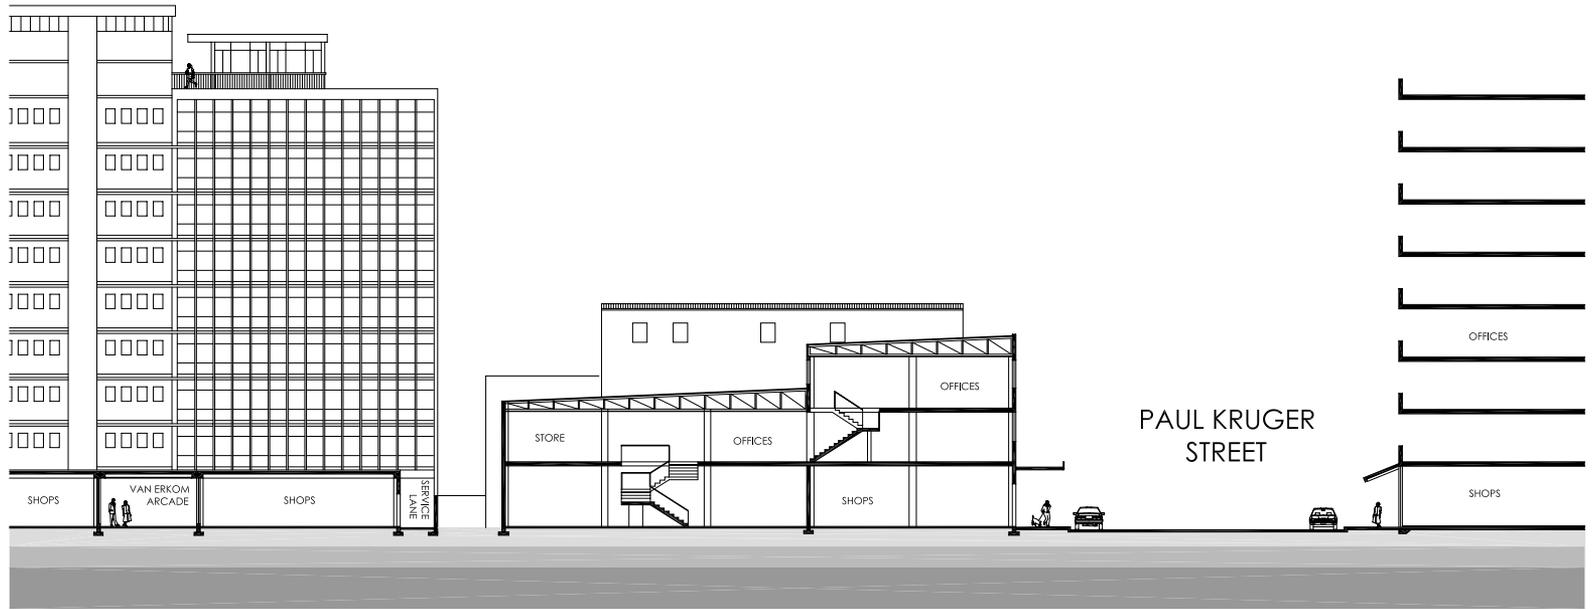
SECTION THROUGH PRETORIA OFFICE SUPPLIES BUILDING - VAN ERKOM BUILDING ON THE LEFT
